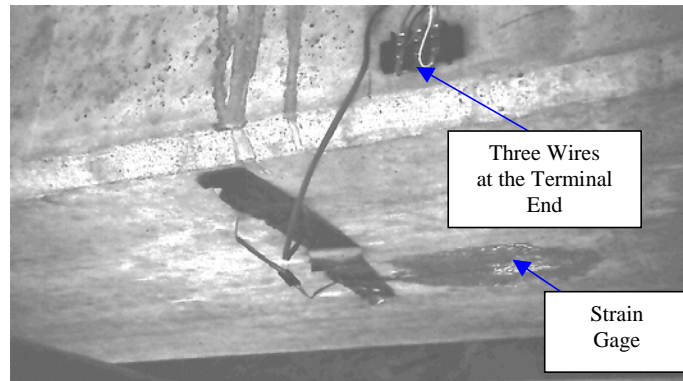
Wire Concrete Gage Placed at the Extreme Bottom Fiber of the Precast Section
